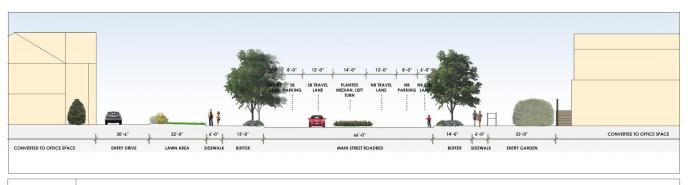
CORRIDOR SECTION 1 - PROPOSED CROSS-SECTION OF MAIN STREET AT SOUTHARD COURT
